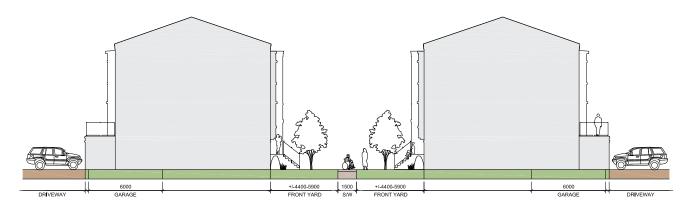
Conceptual section of typical townhouse and courtyard / walkway interface.
